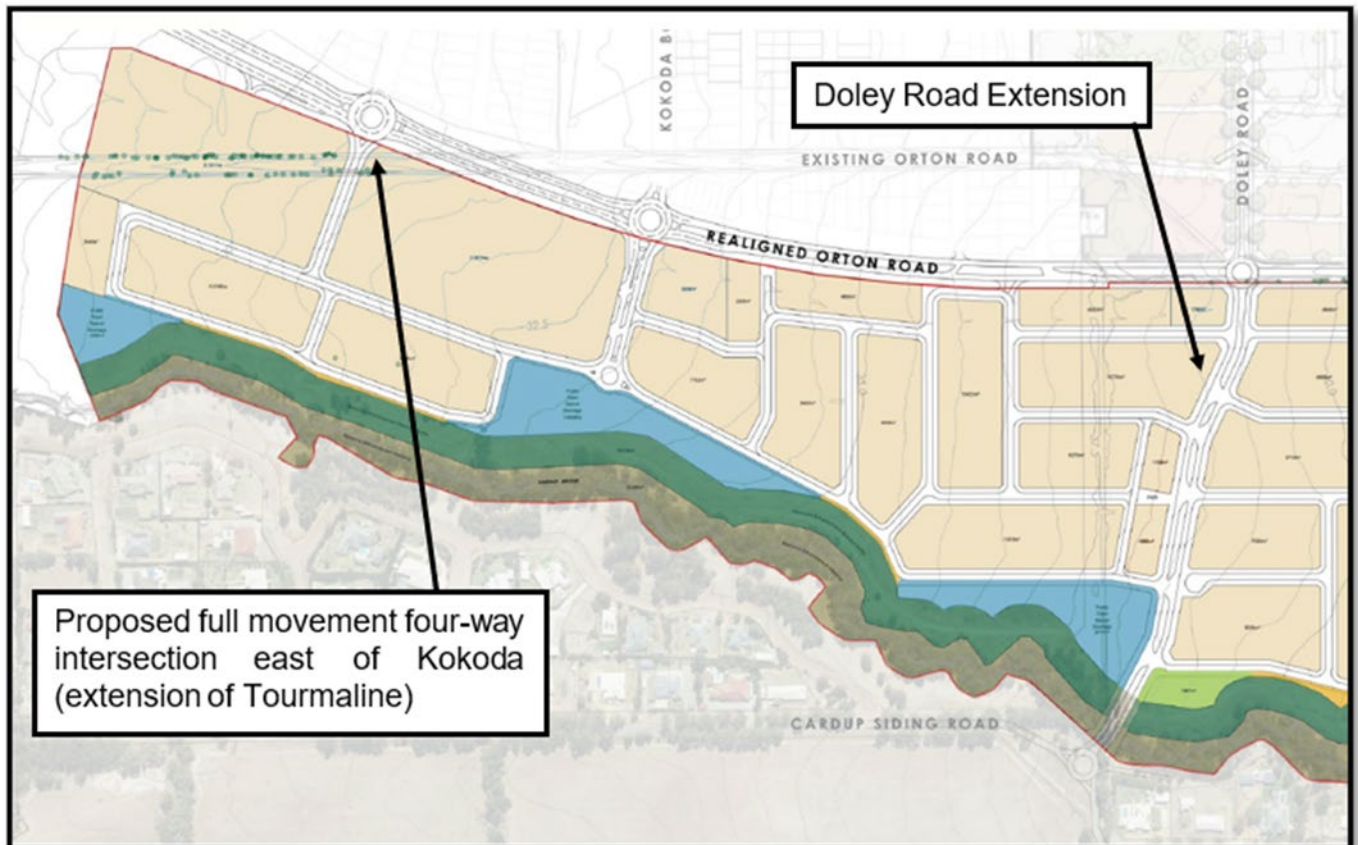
Proposed Four-way Roundabout East of Kokoda & Doley Road Extension
